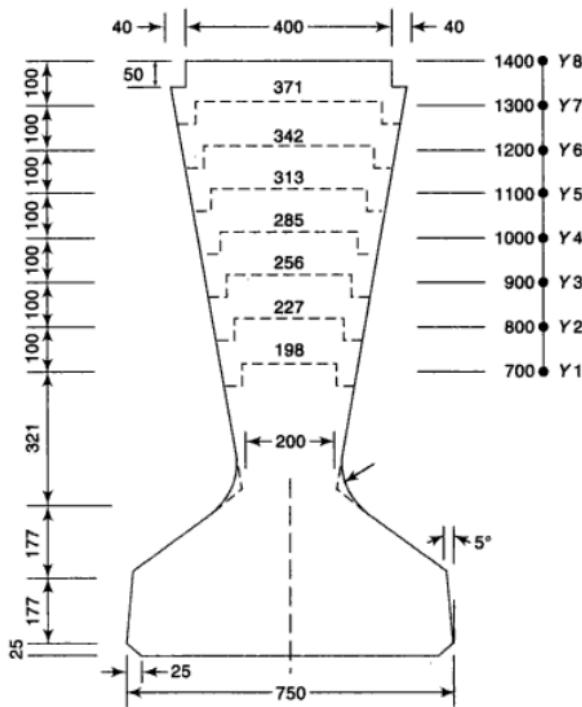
Cross-Section of Standard Y Beams (U.K.)
